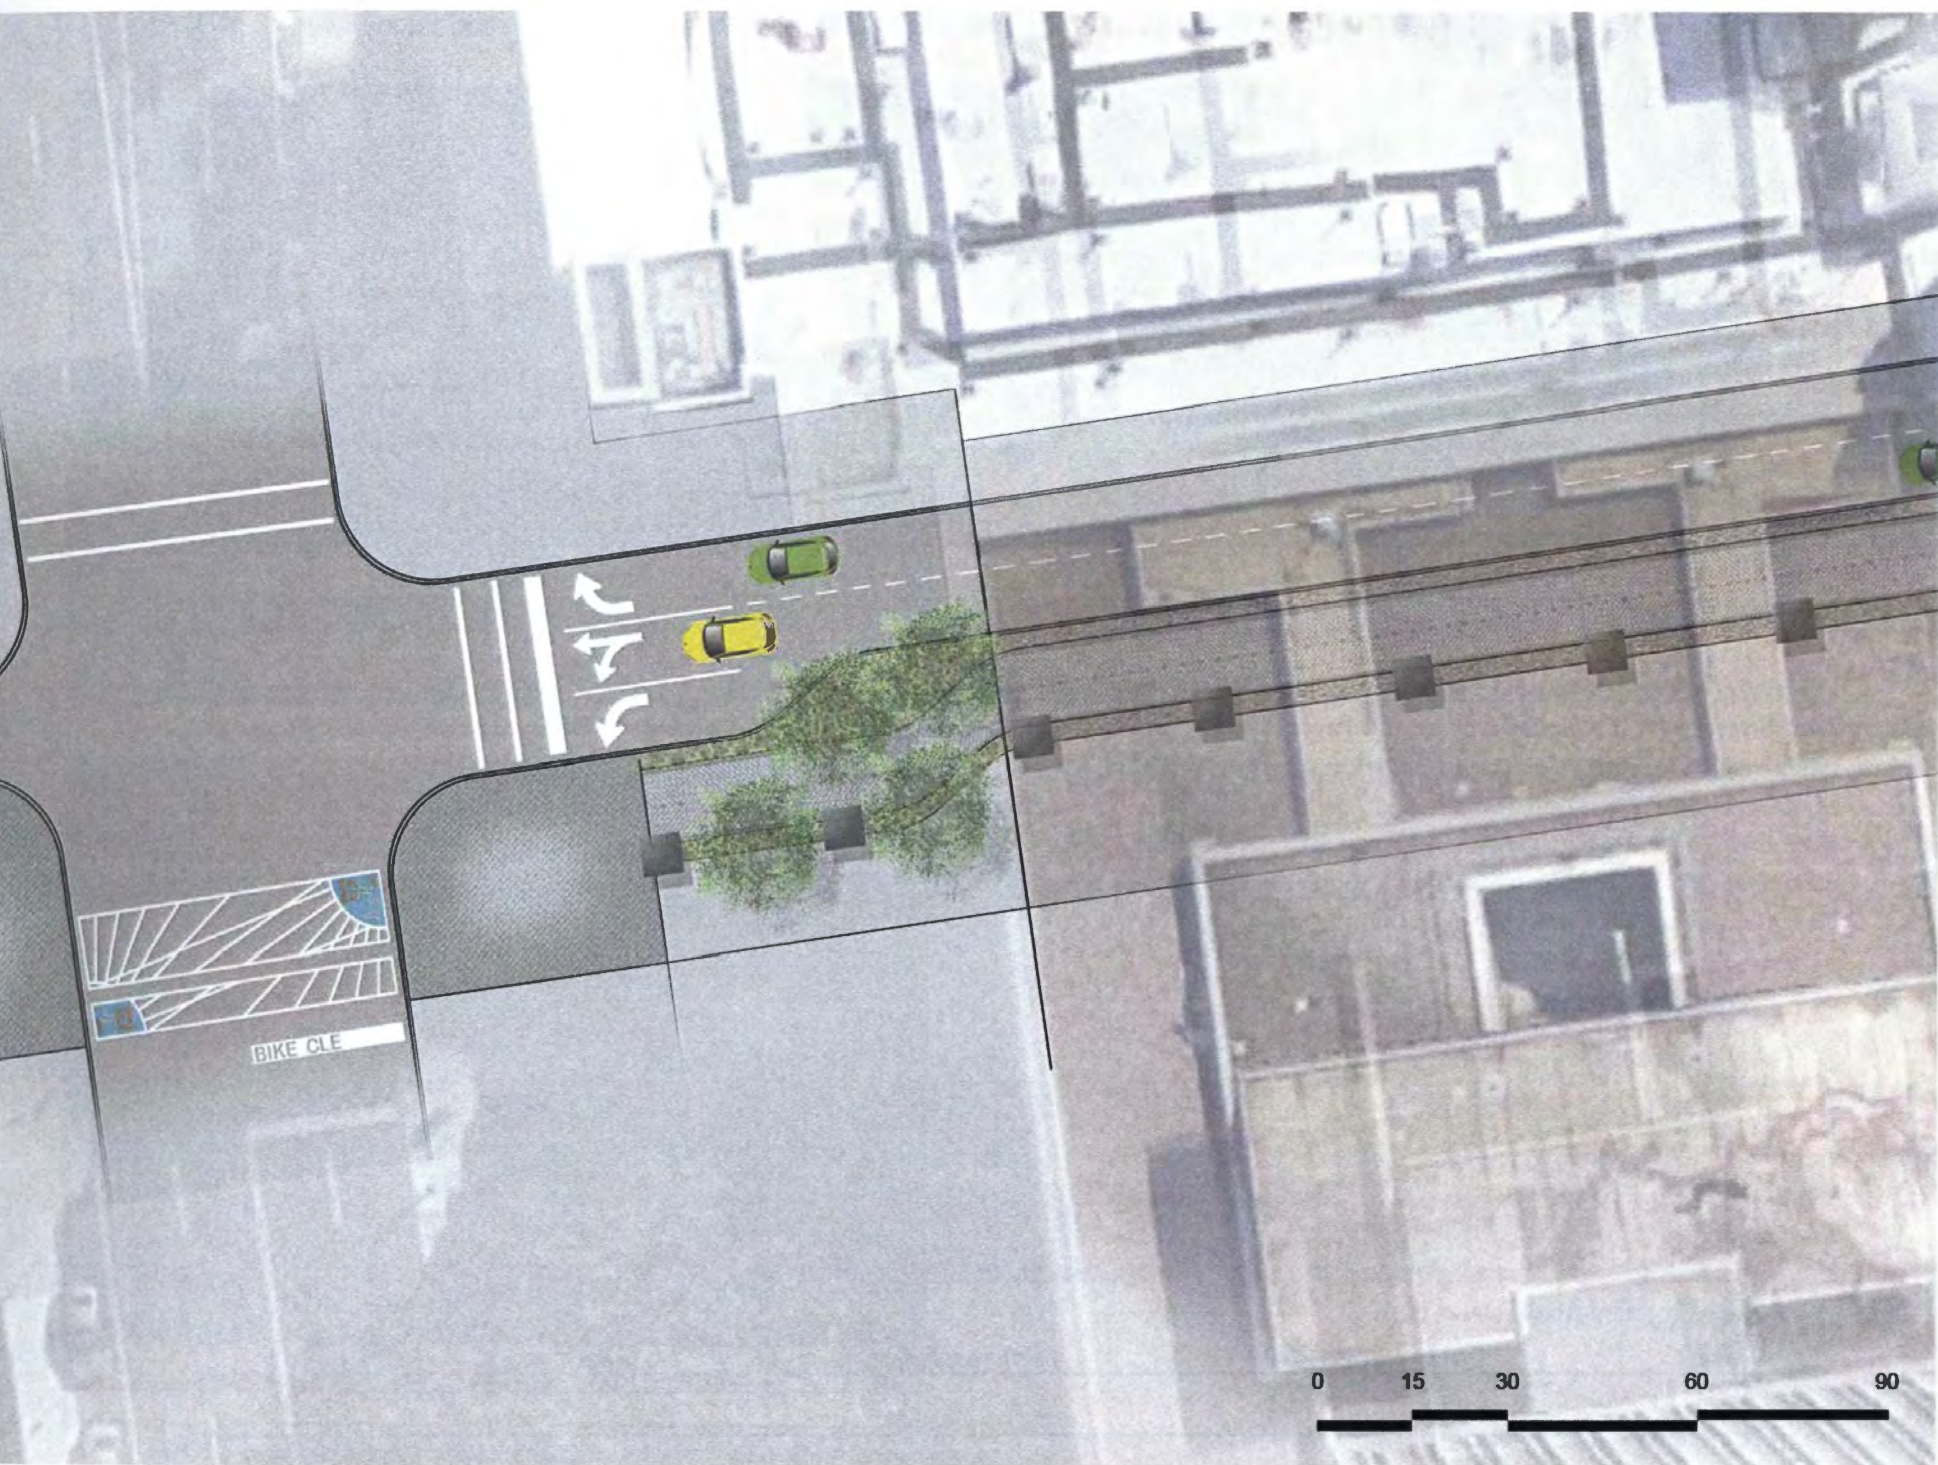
East 22nd Street between Euclid Avenue and Chester Avenue Proposed Section
